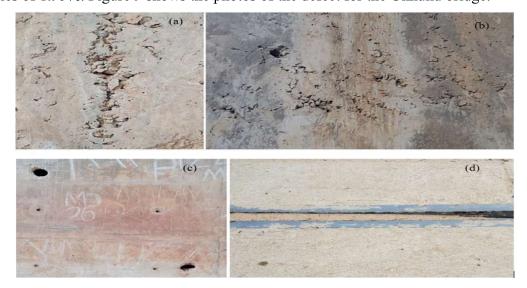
Photos of defects on Unkuku bridge (a) and (b) abutments honeycombs, (c) defective weep hole, and (d) blockage of expansion joint.
